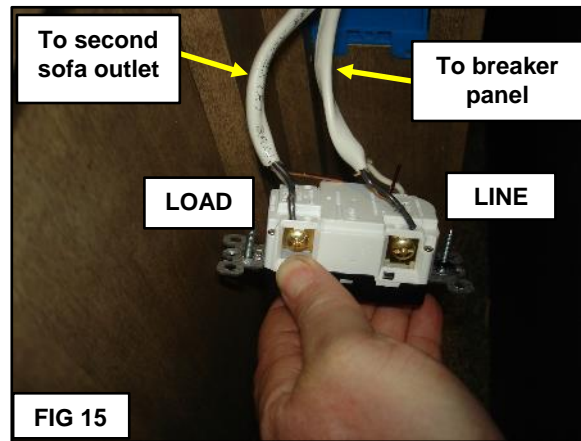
Romex cable running to the other outlet at the sofa connects to the LOAD side of the GFI. Attach black wire to "hot" terminal, white wire to "white" terminal. Insert wires into holes above screws and tighten screws.
